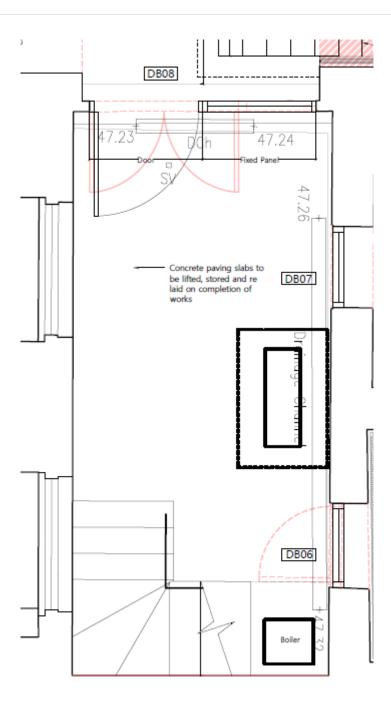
Proposed Installation Site Plan, Basement Lightwell
